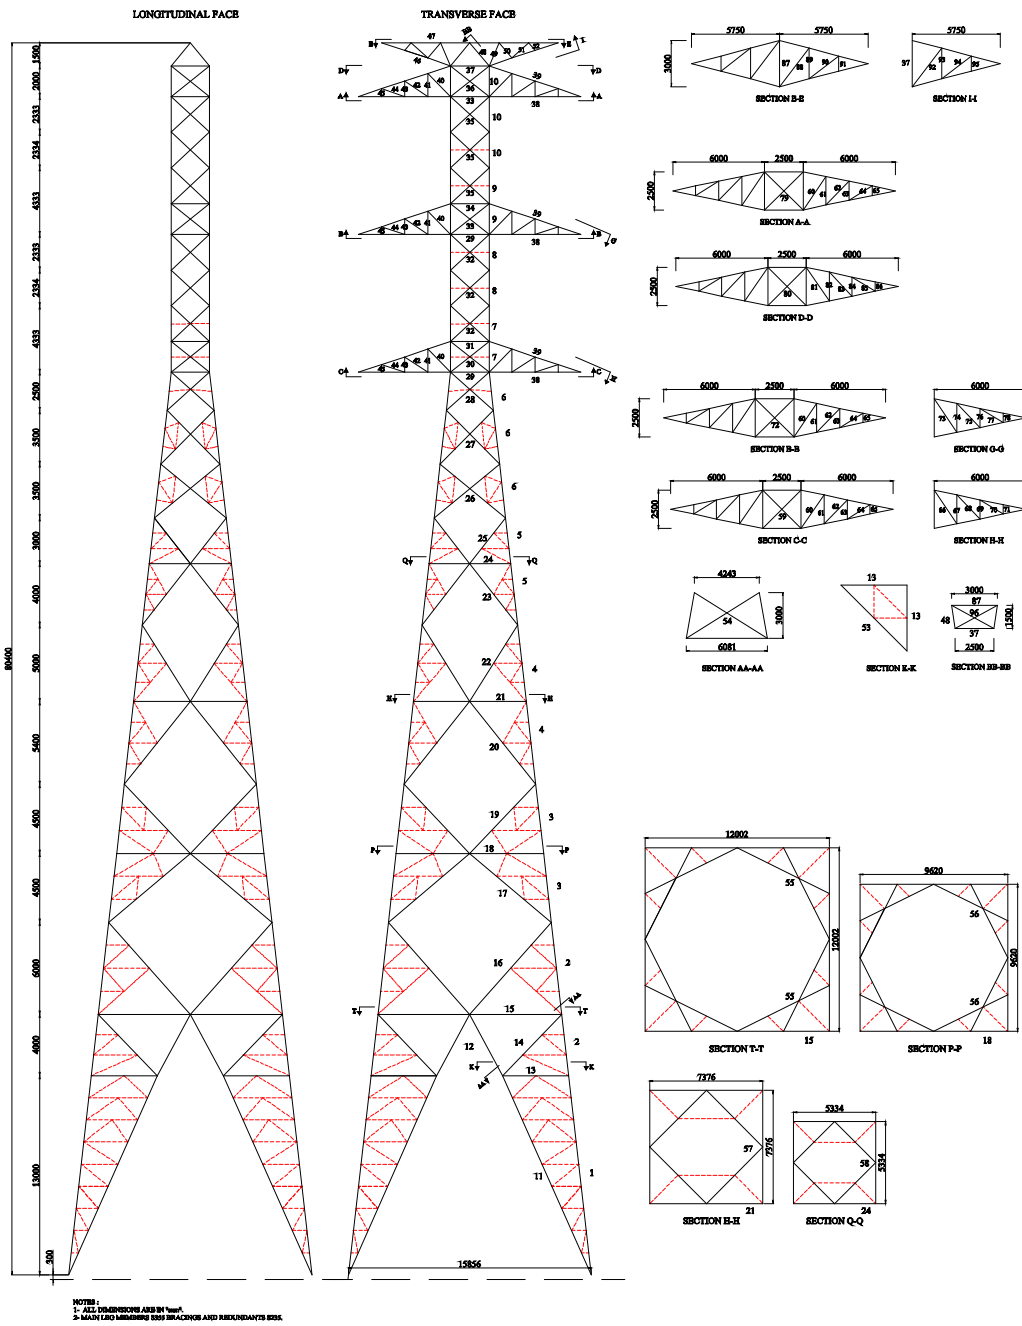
The 693-member, 400kV suspension tower (all units are in mm).
